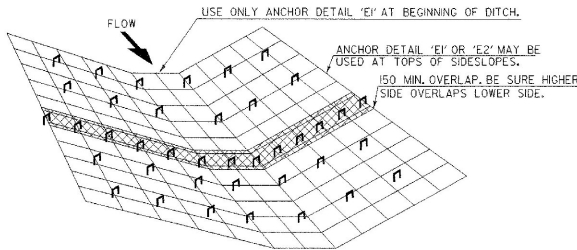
DETAIL "E" ANCHOR DETAILS FOR EROSION MATTING
